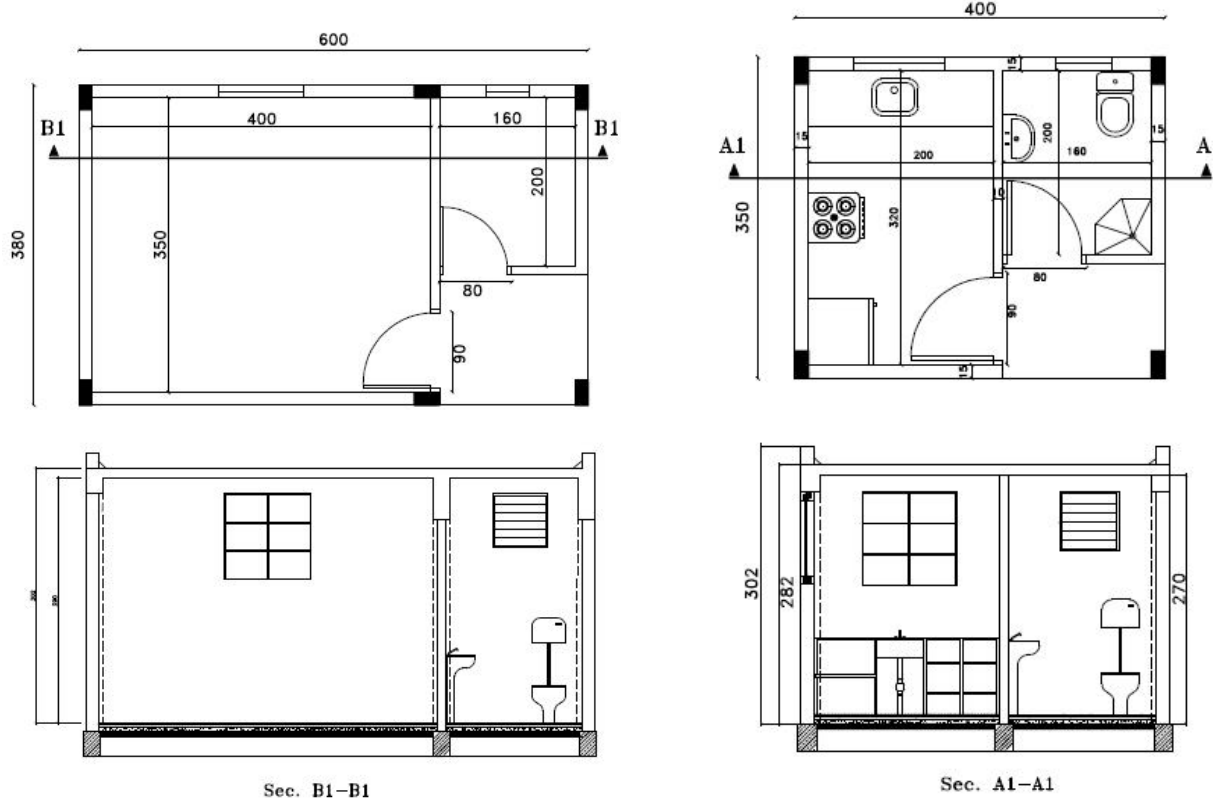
Basic architectural plans and sections - A bedroom with a bathroom unit, and a kitchen bathroom unit.
